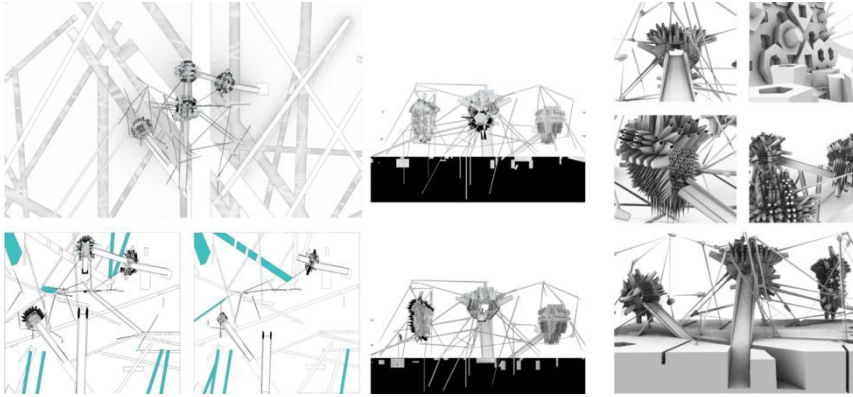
Kindergarten Project ex.1 in Architectural Design Studio 1 - plans sections and model
